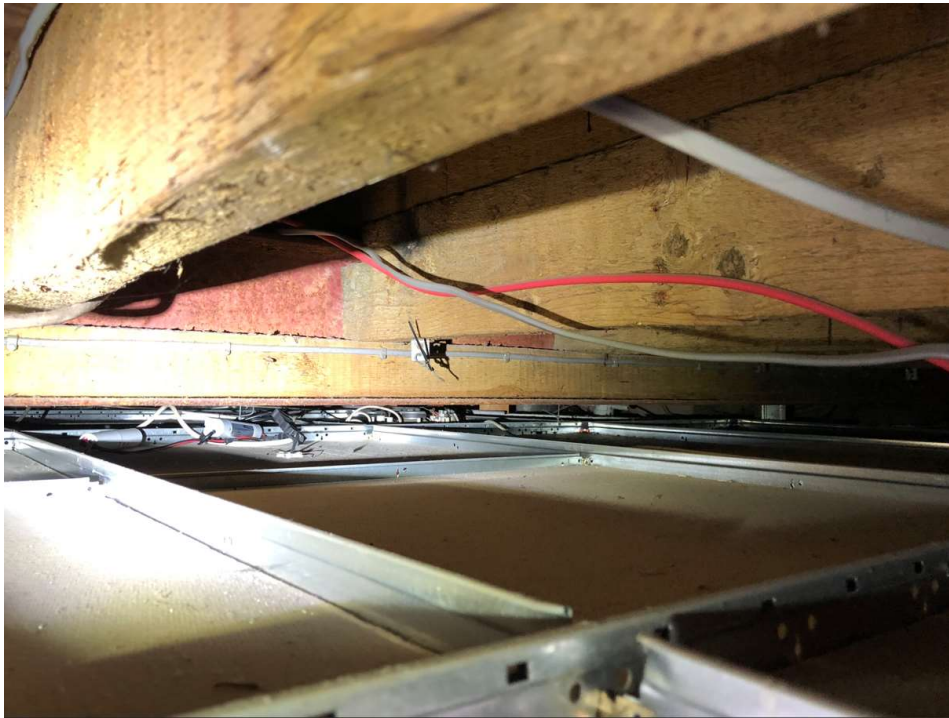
Main reception extension. Timber joists supported on a small steel frame.
